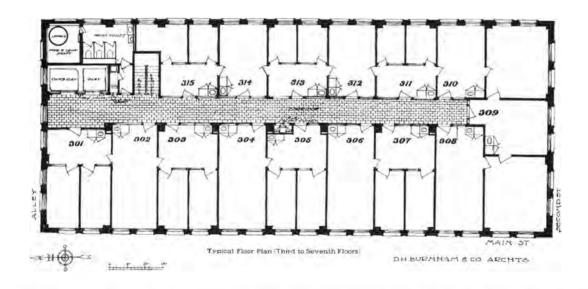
Divided upper story plan in June 1910 promotional booklet (Putnam Trust collection).
